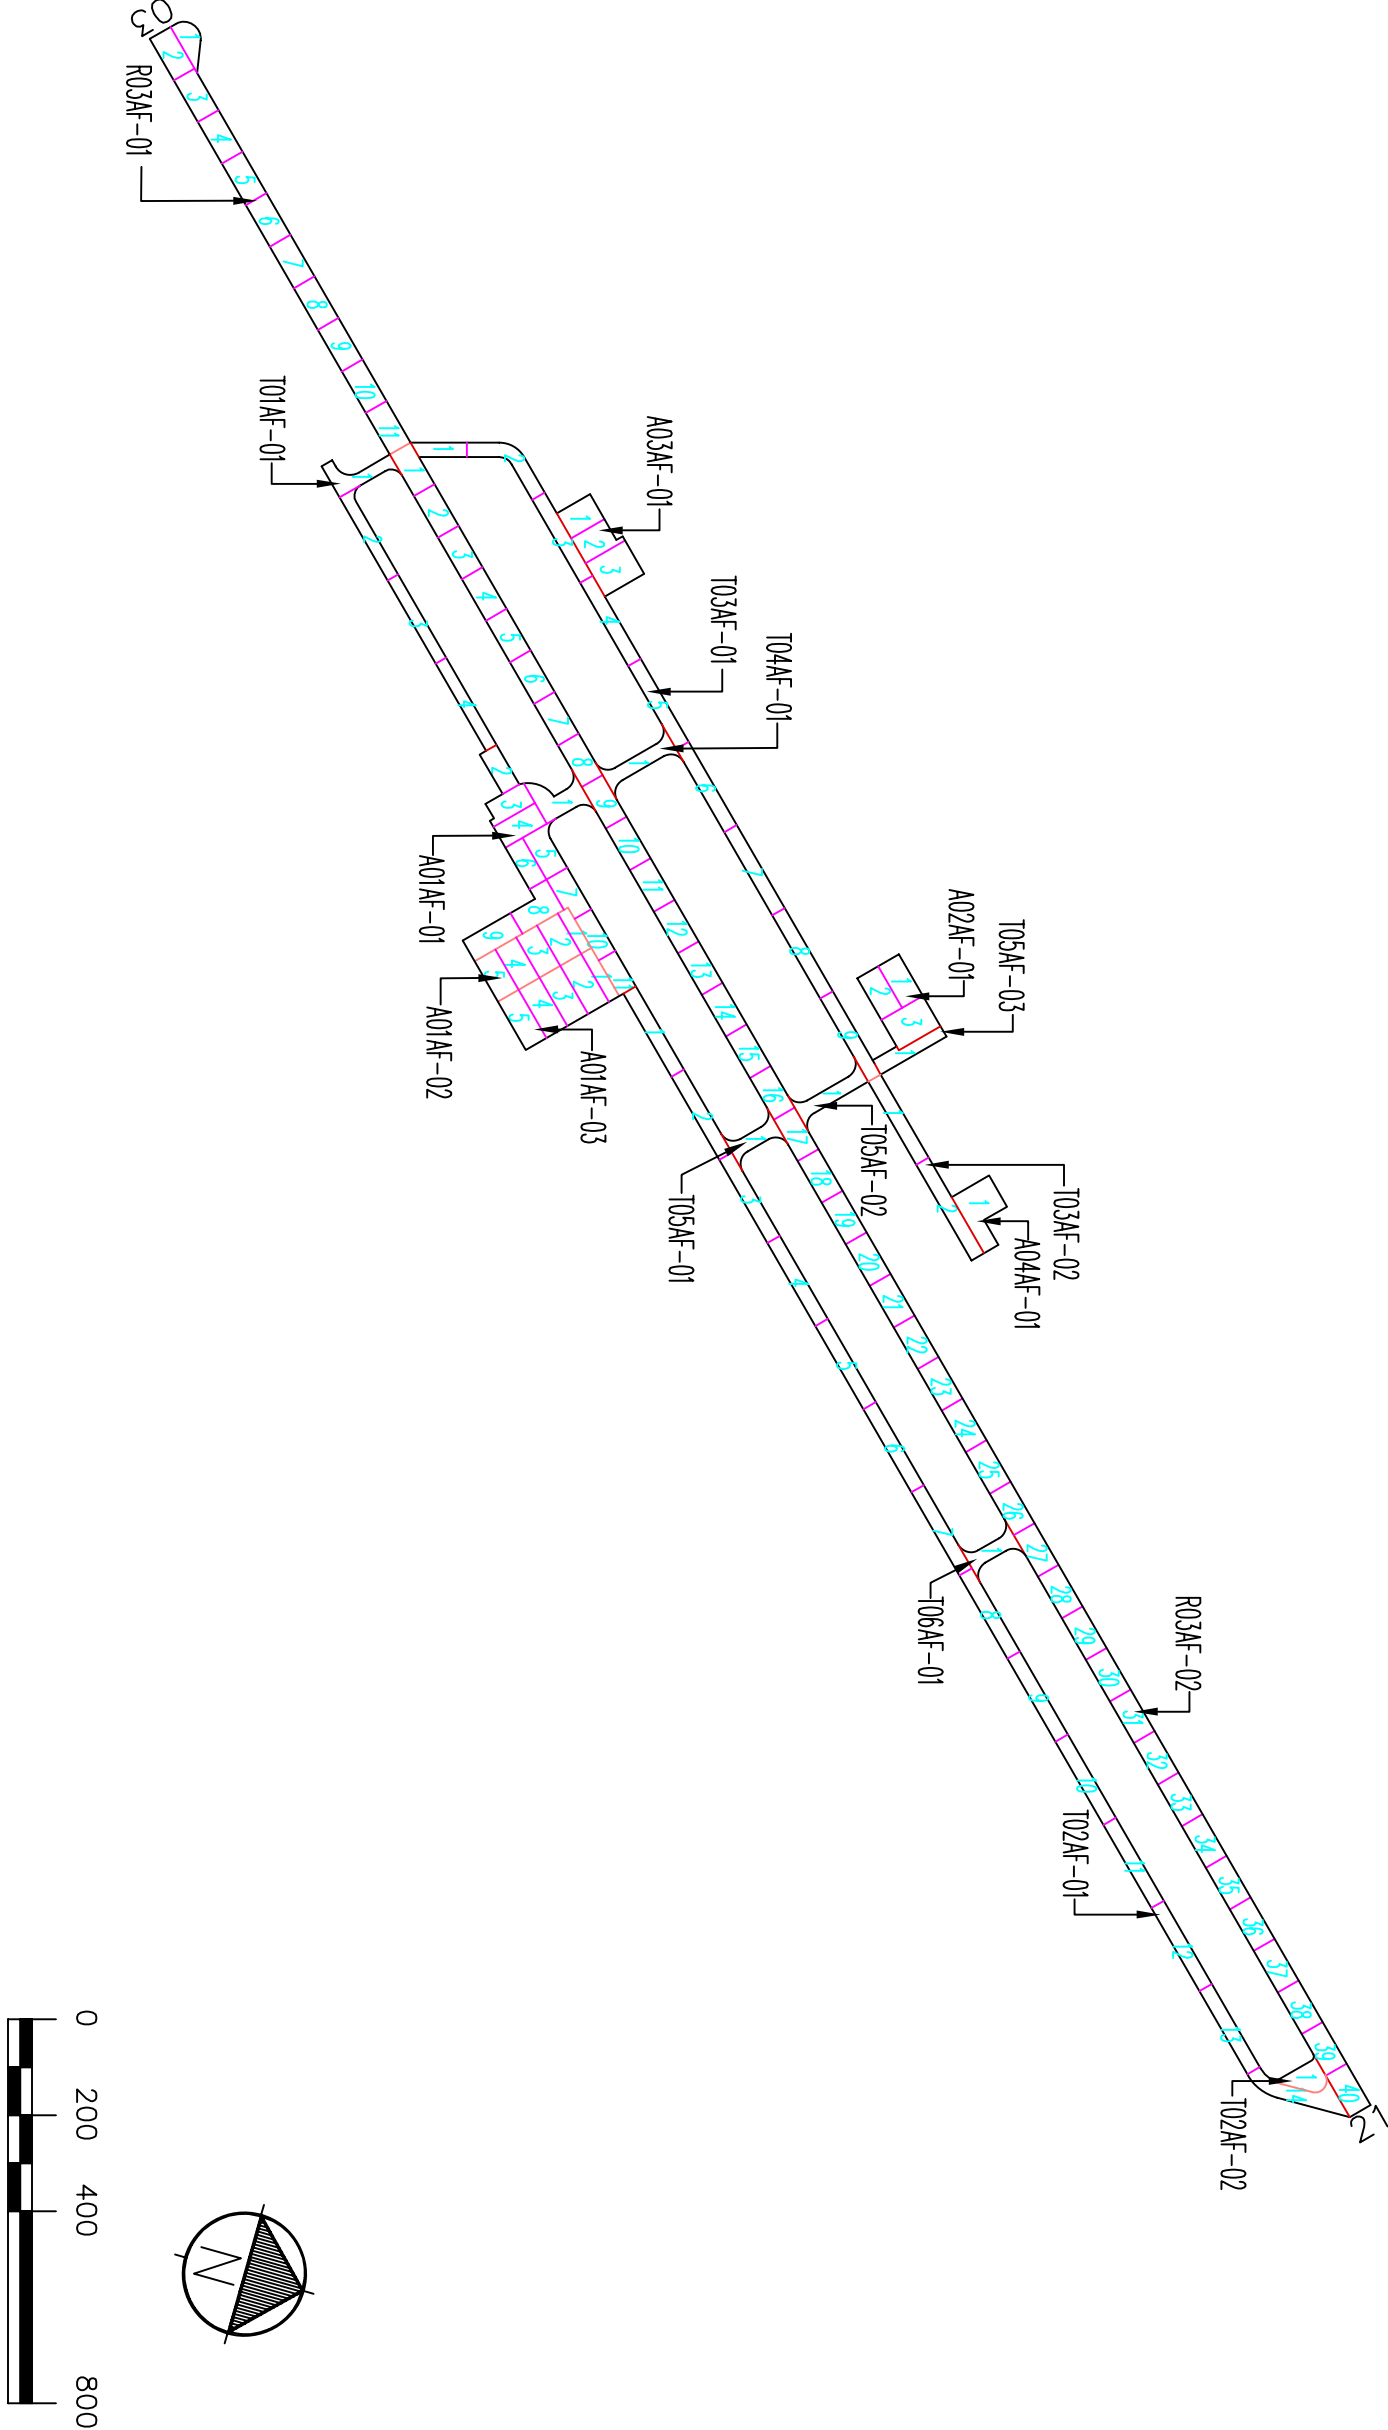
Pavement Branch, Section and Sample Unit Layout.
